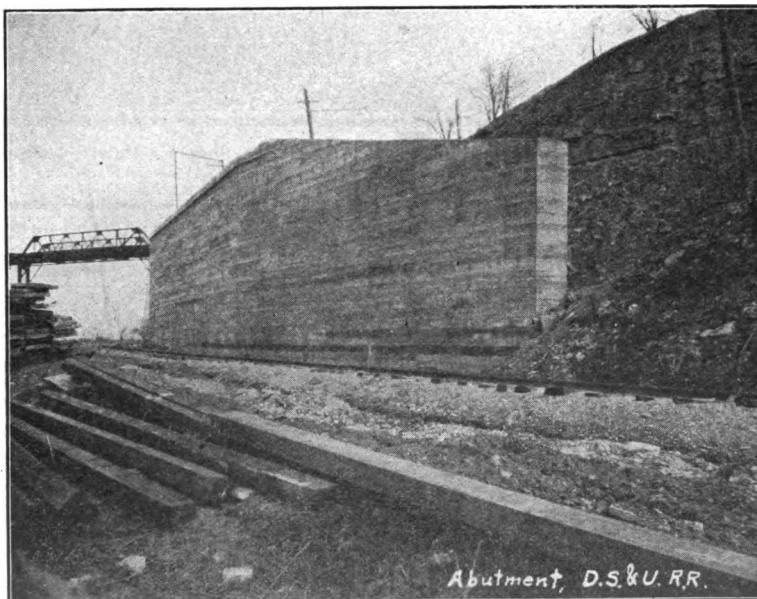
Concrete Abutment on the D. S. & U. R. R., Near Dayton, Ohio.
